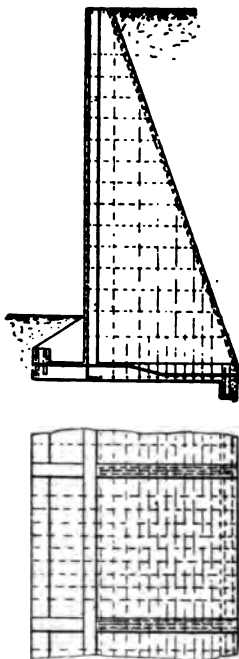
Retaining Wall with Counterforts Designed by Hennebique.
